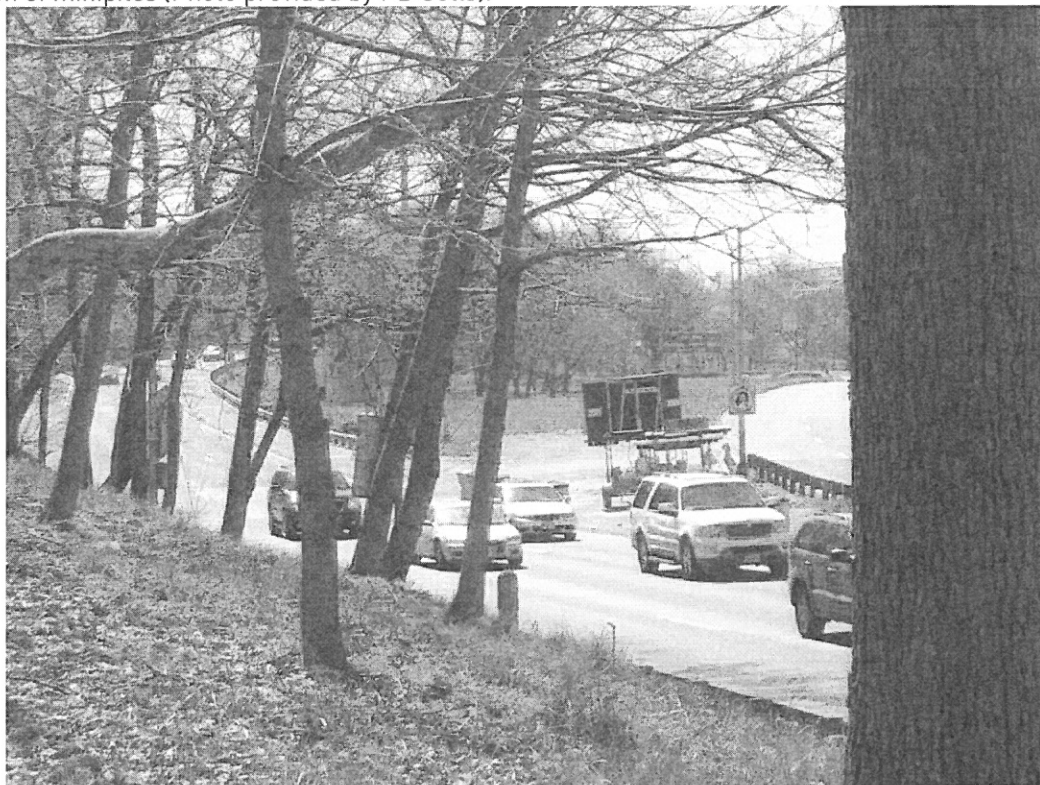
View south from east side of project area in the vicinity of 7th Avenue across lanes of Whitestone Expressway. Note slope down to roadway. The staging area is in the center of the photo.
